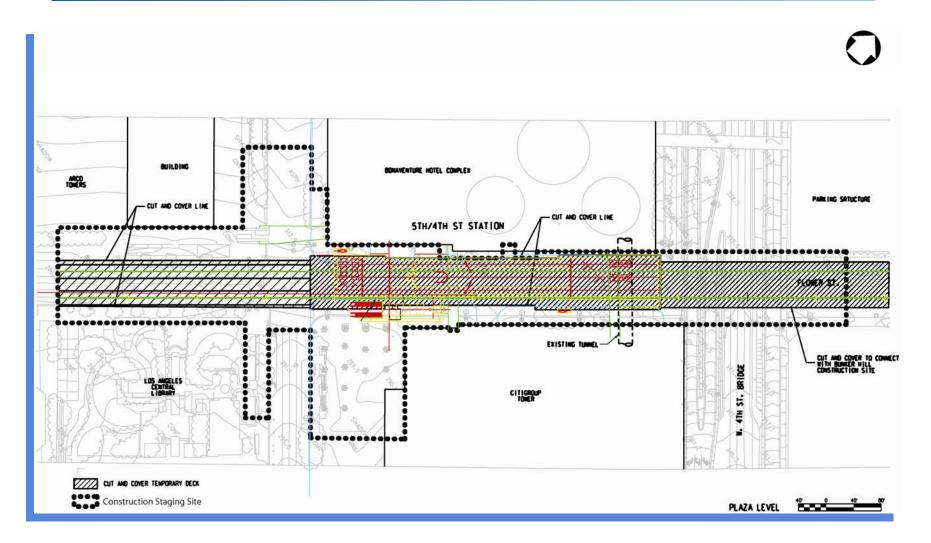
Flower/5<sup>th</sup>/4<sup>th</sup> Street Station (Underground Emphasis LRT Alternative and Fully Underground LRT Alternative)
